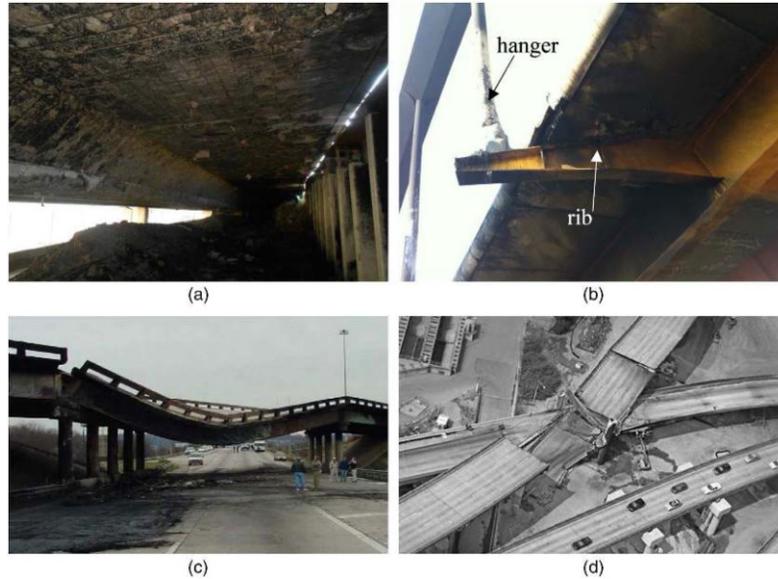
Some examples of bridge damage levels: (a) damage level 2: concrete spalling after a fire in a prestressed concrete bridge in Madrid, Spain; (b) damage level 3: damage to the hanger and rib of a bowstring bridge in Spain; (c) damage level 4: I-20/I-59/I-65 interchange in Birmingham, Alabama, U.S.; (d) damage level 5: collapse of a portion of the MacArthur Maze in Oakland, California, U.S. (Photo from [101])
